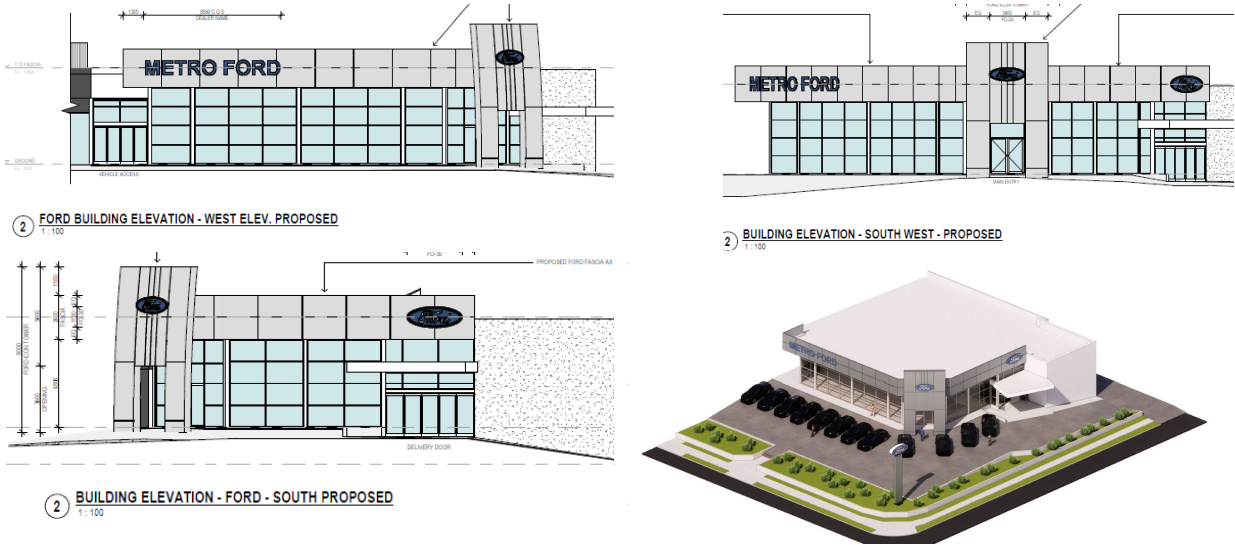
Proposed Ford Site Plan Displaying Proposed Facia and Pylon prepared by Wim Architects
